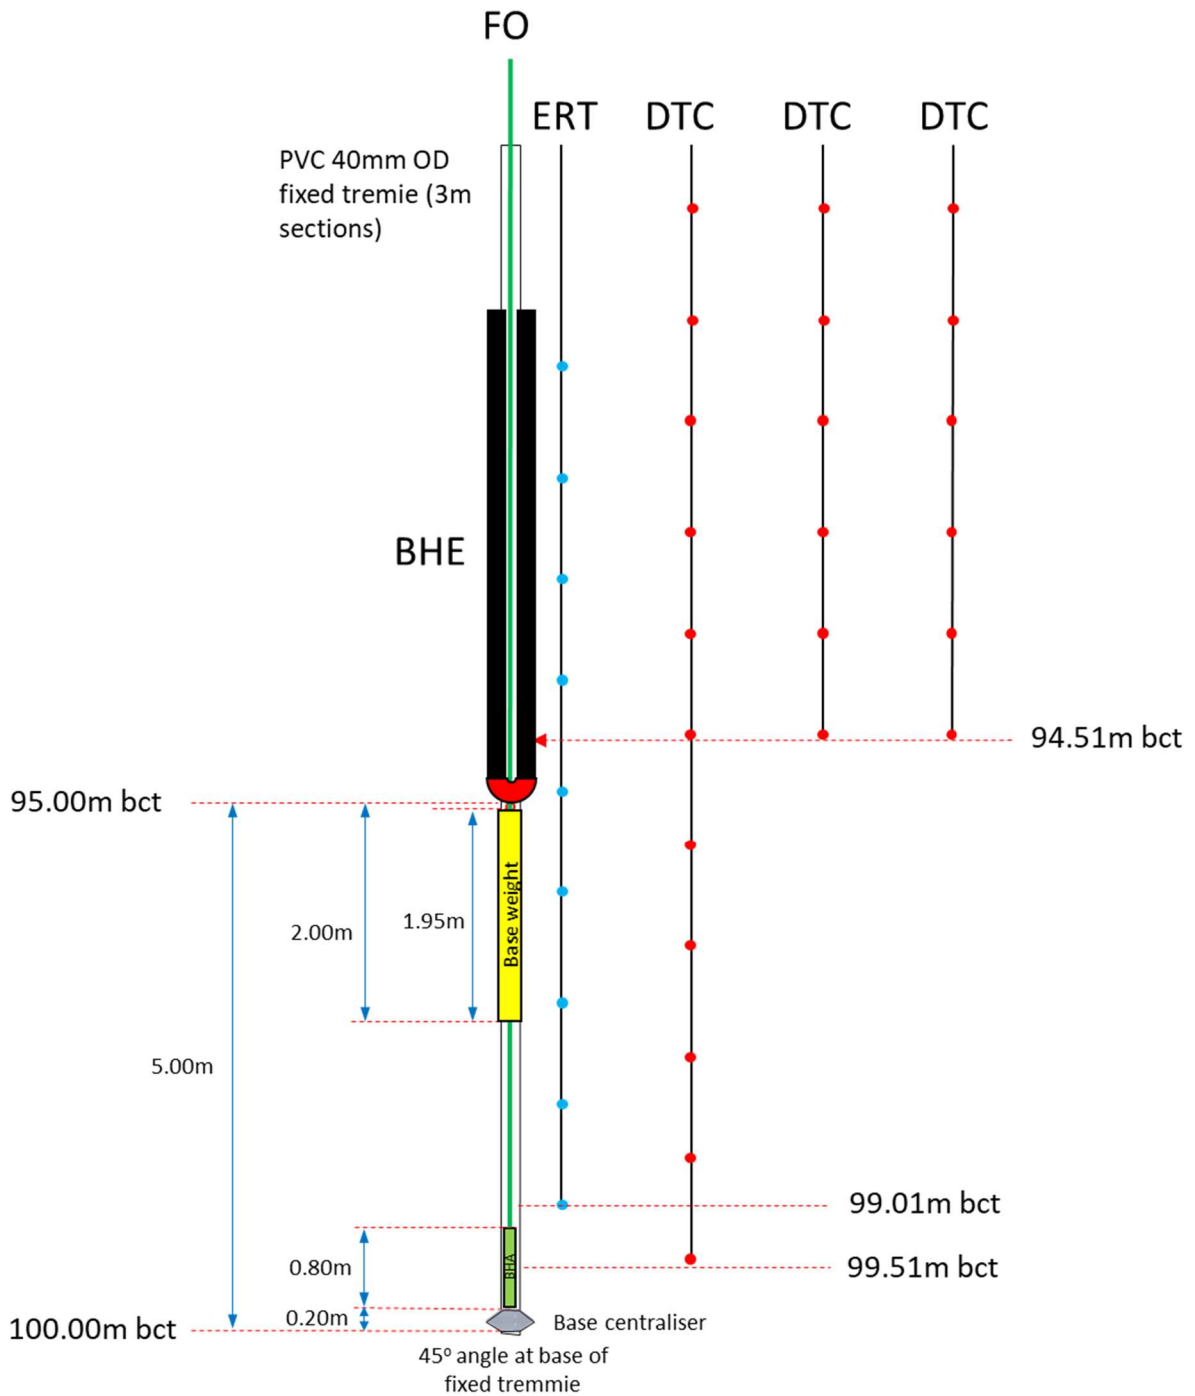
Bottom hole assembly schematic for TH0423 showing depth of install and each sensor string
